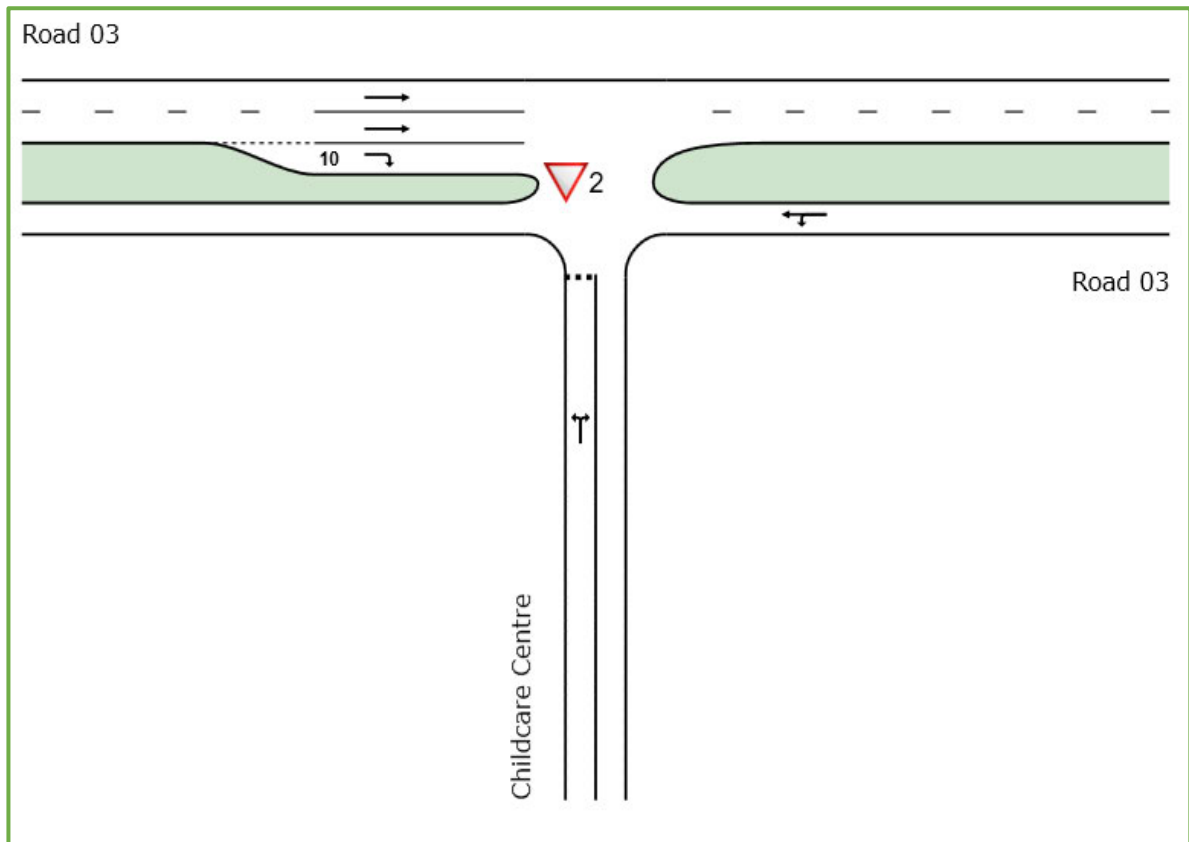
Proposed Childcare Centre Access / Road 03 Intersection Layout (Based on Calibre Report)
